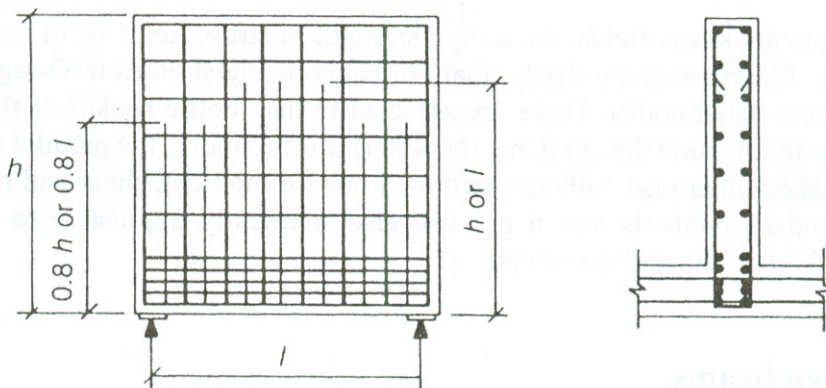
Recommended reinforcement layout in a deep beam for loads from a lower floor (schematic) [MC90, Fig. 9.2.7]
